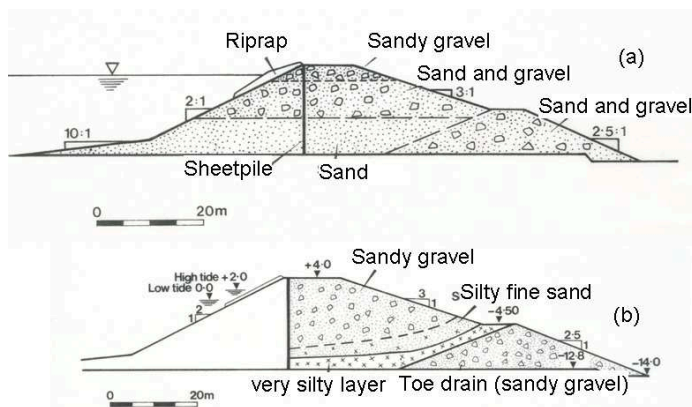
Cross section through cofferdam for Dubai Dry Dock: (a) as intended, (b) as built.
